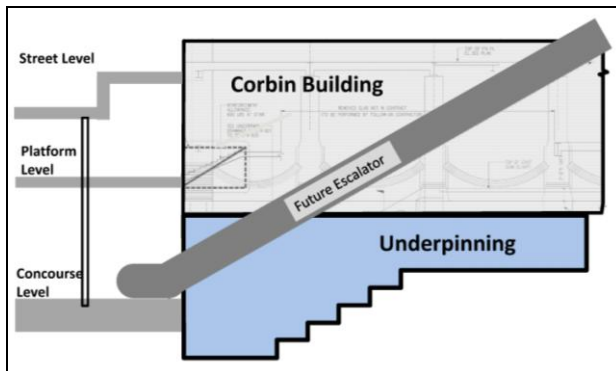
Schematic section showing the underpinning of the Corbin Building. Facing north.
